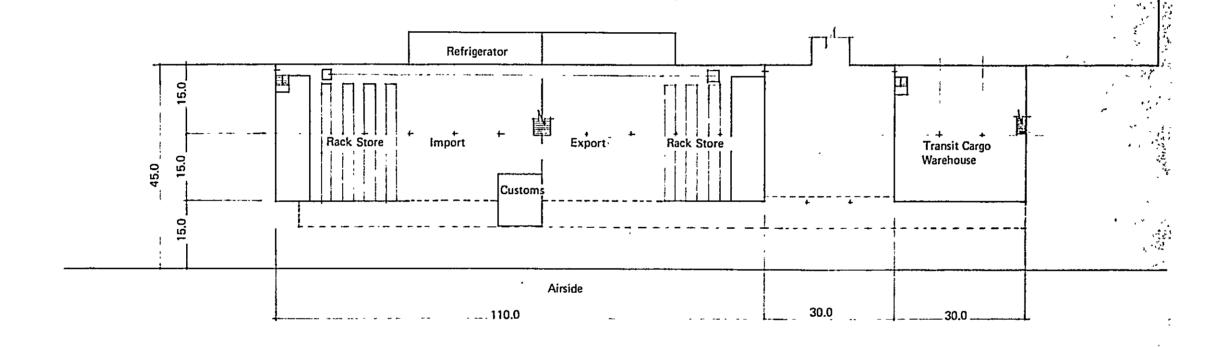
Proposed Cargo Terminal Building 1st Floor Plan
